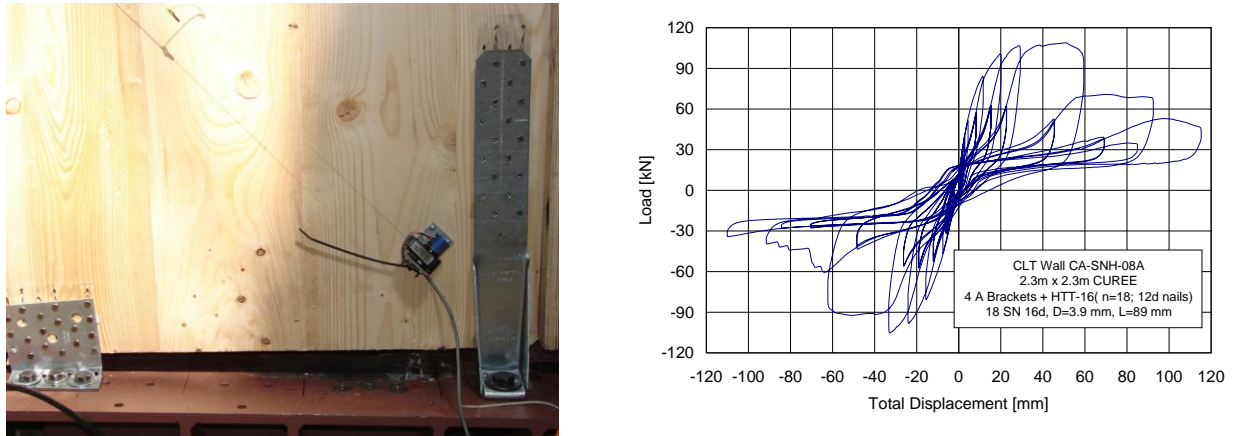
a) A corner of wall 08A during testing; b) Hysteresis loop for the wall 08A
